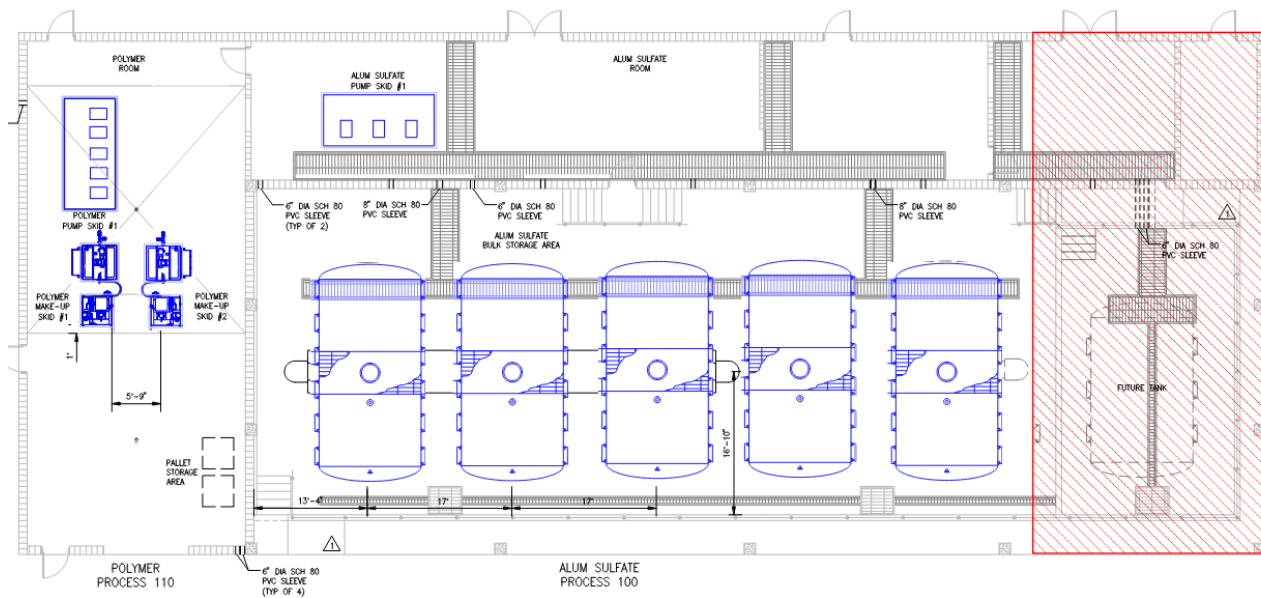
Concept Layout of Proposed Alum/Polymer Storage and Feed Building
